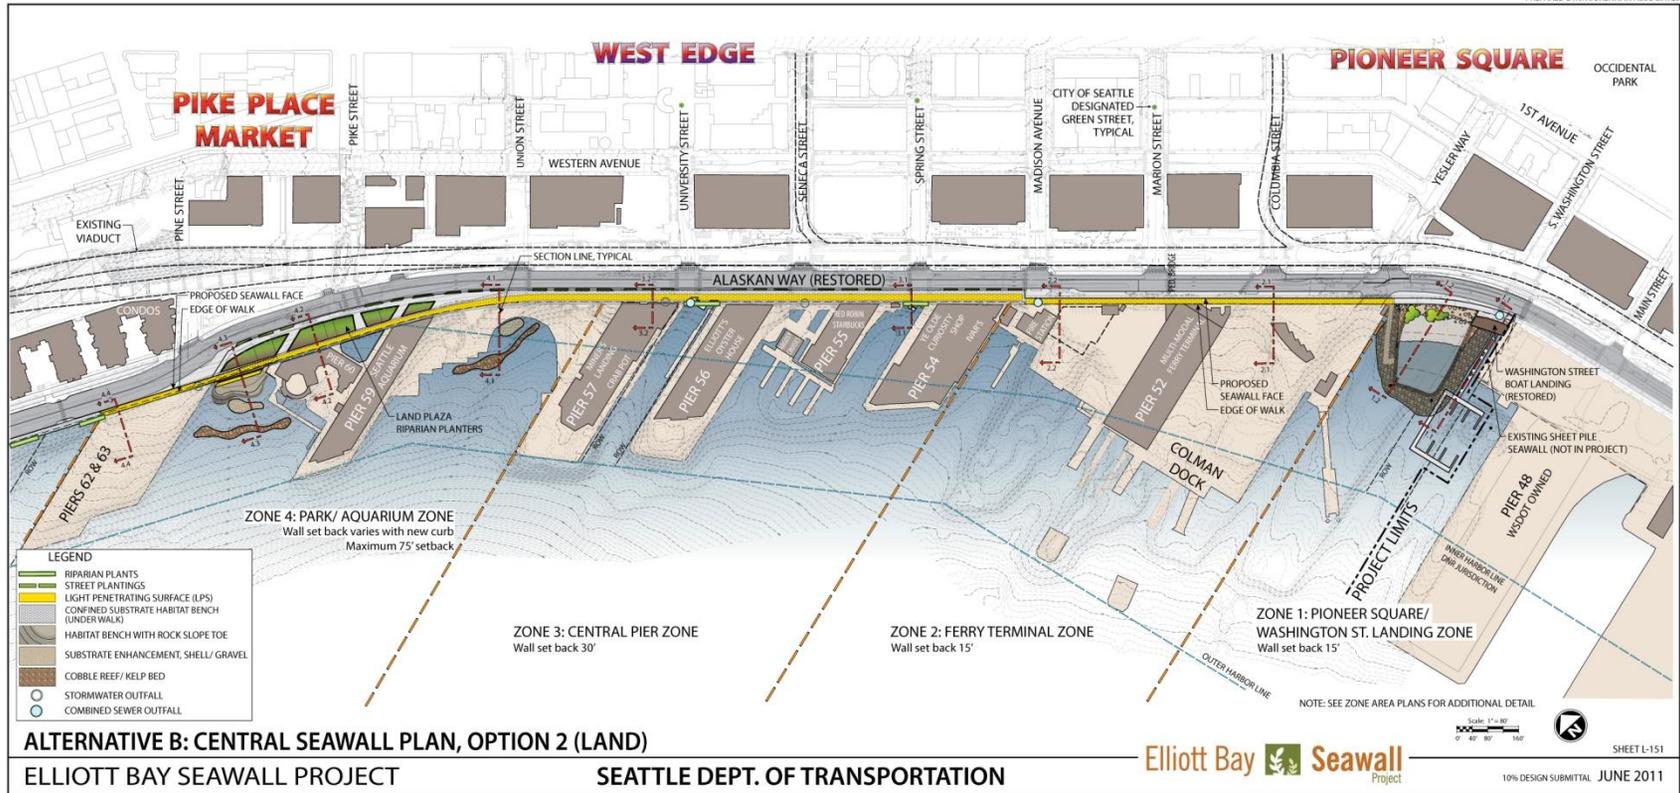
Alternative B: Central Seawall Plan, Option 2
